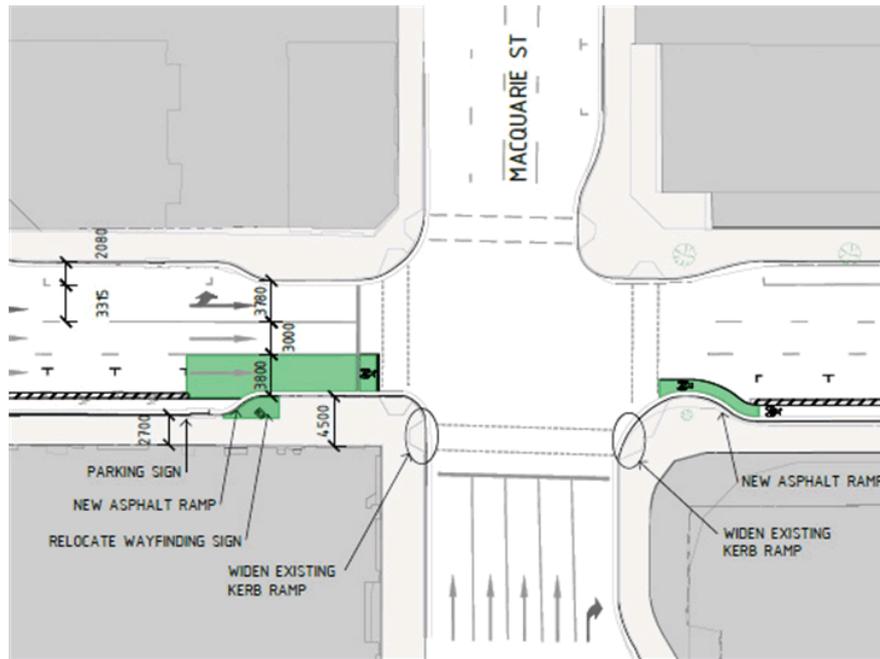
Intersection approach detail - Campbell Street at Macquarie Street
